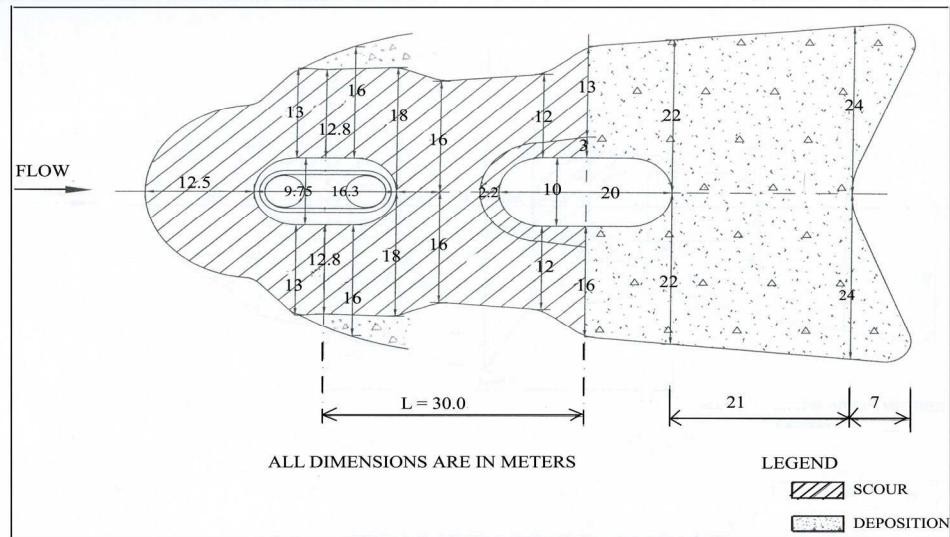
Scour and deposition pattern around a pier of the existing bridge in the presence of the proposed pier for $L/b = 3.0$
